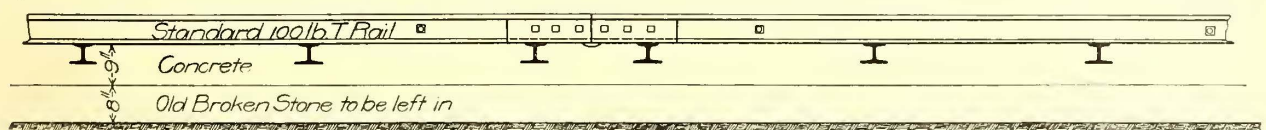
T-Rail Construction with Steel Ties on Old Stone Ballast in Syracuse
